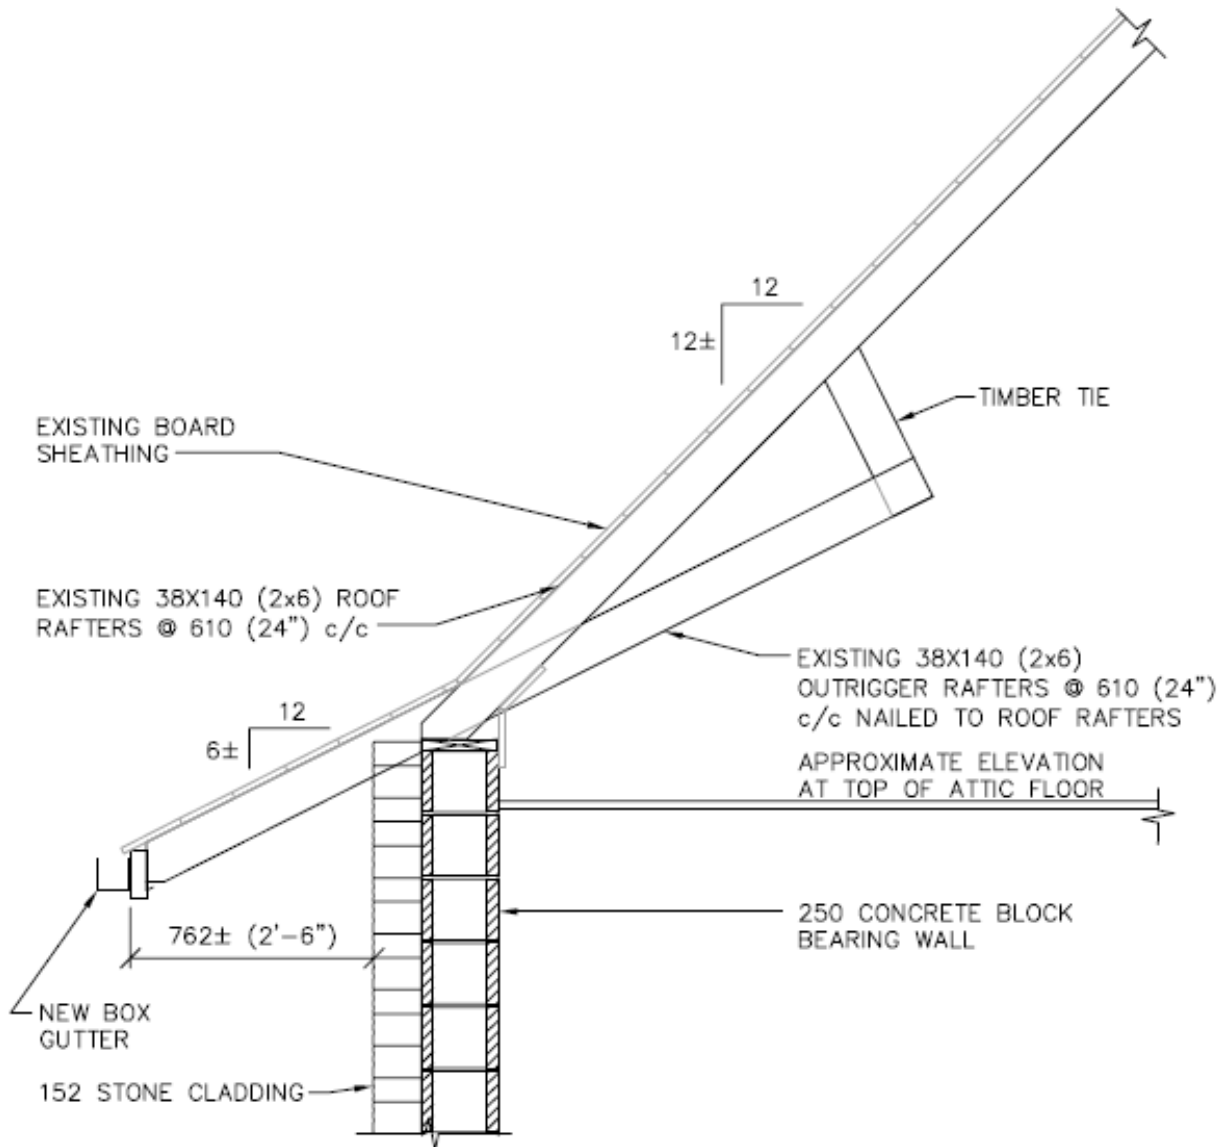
Presumed Existing Roof Framing Geometry at Bearing Wall
